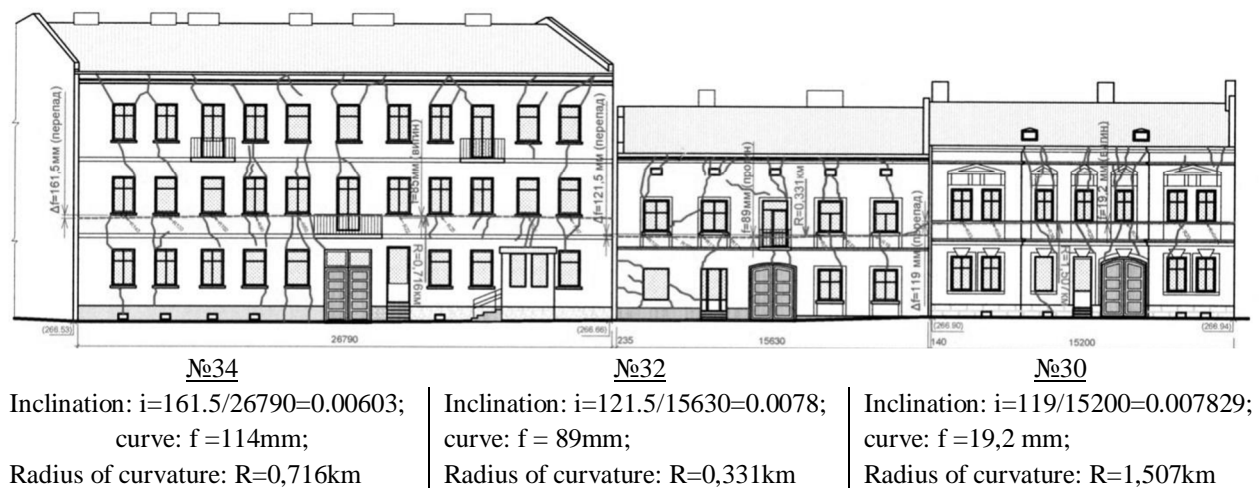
Picture of crack formation on the main façade of a group of residential buildings and characteristic geometric parameters of deformation
